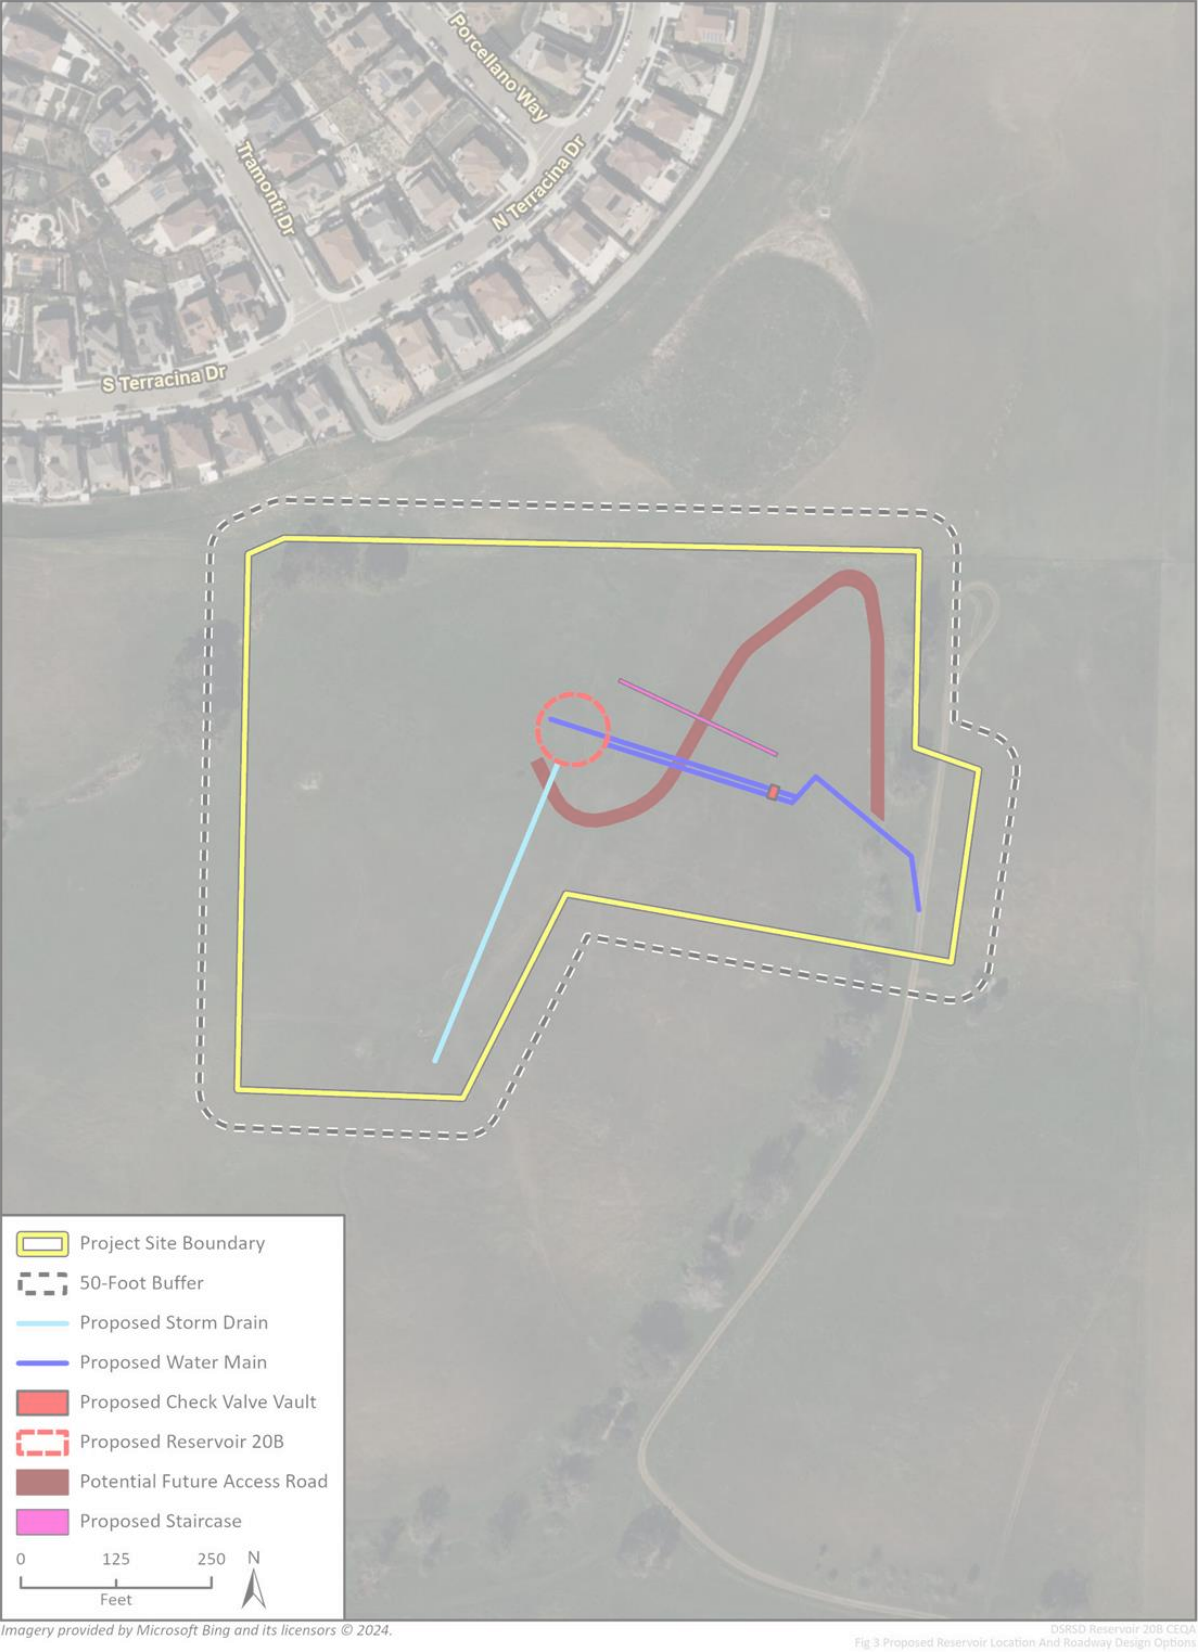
, *Proposed Project Components*, (new and original figures provided below) has been revised to show the GHAD conservation easement and storm drain alignment, and remove the potential future access road:
